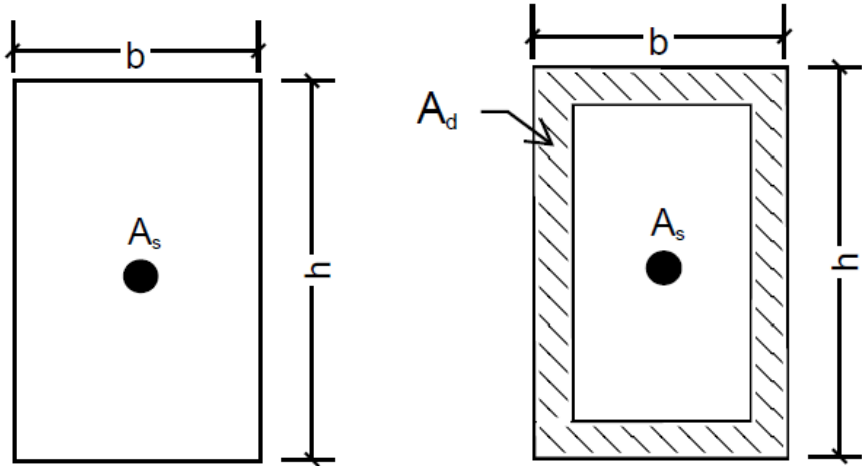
Transformed concrete cross section with the area of steel converted to concrete
